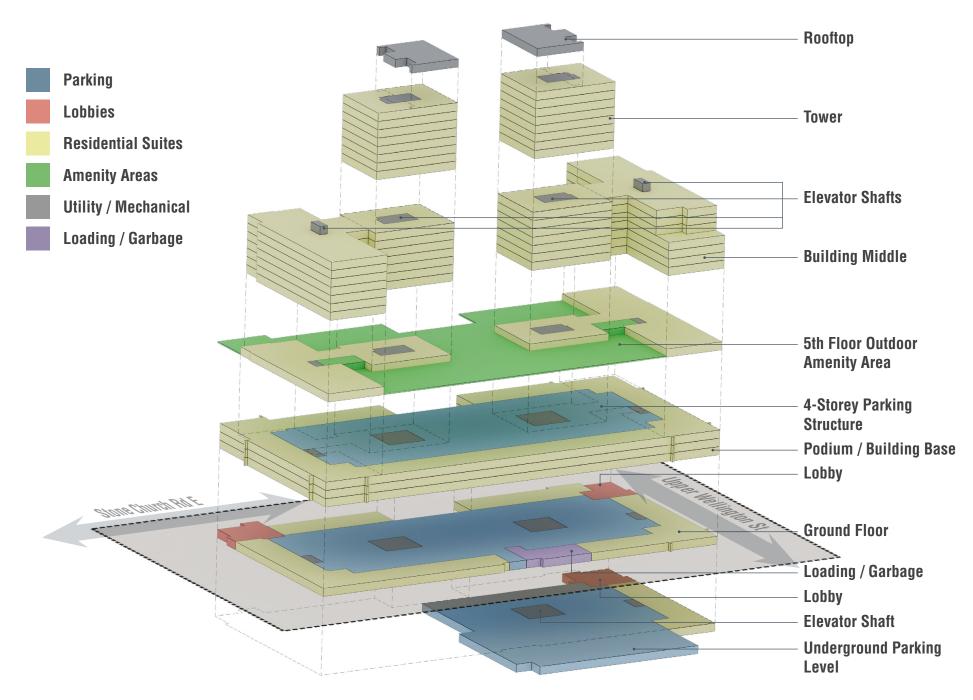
1494 Upper Wellington Street building massing and composition schematic
